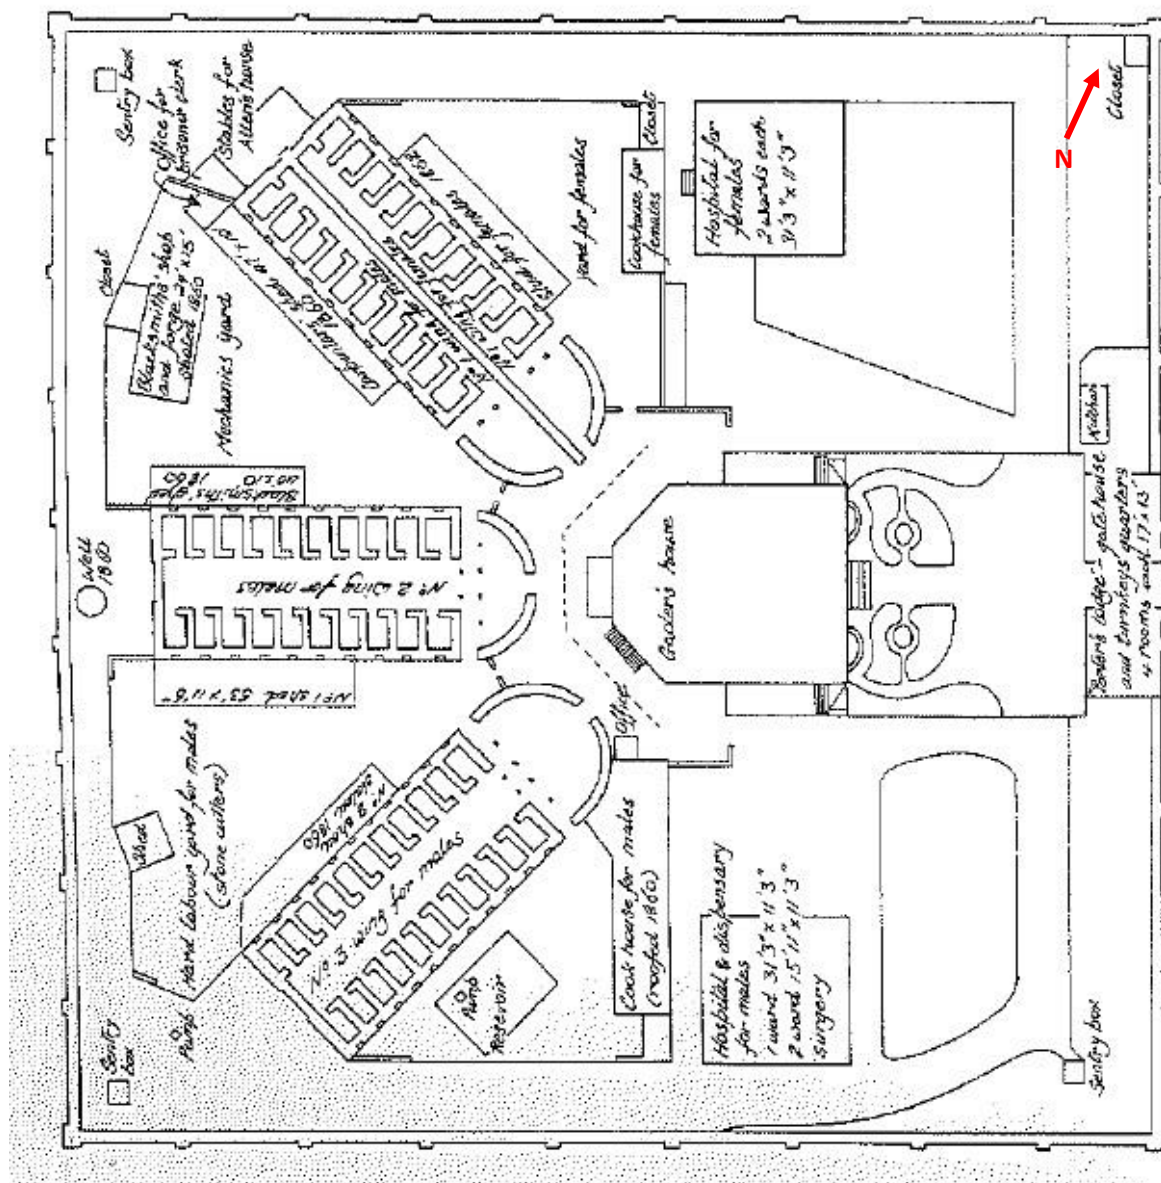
Sketch plan of Parramatta Gaol in 1861 illustrating the gaol's layout, buildings and their functions (Kerr 1955, 19).
